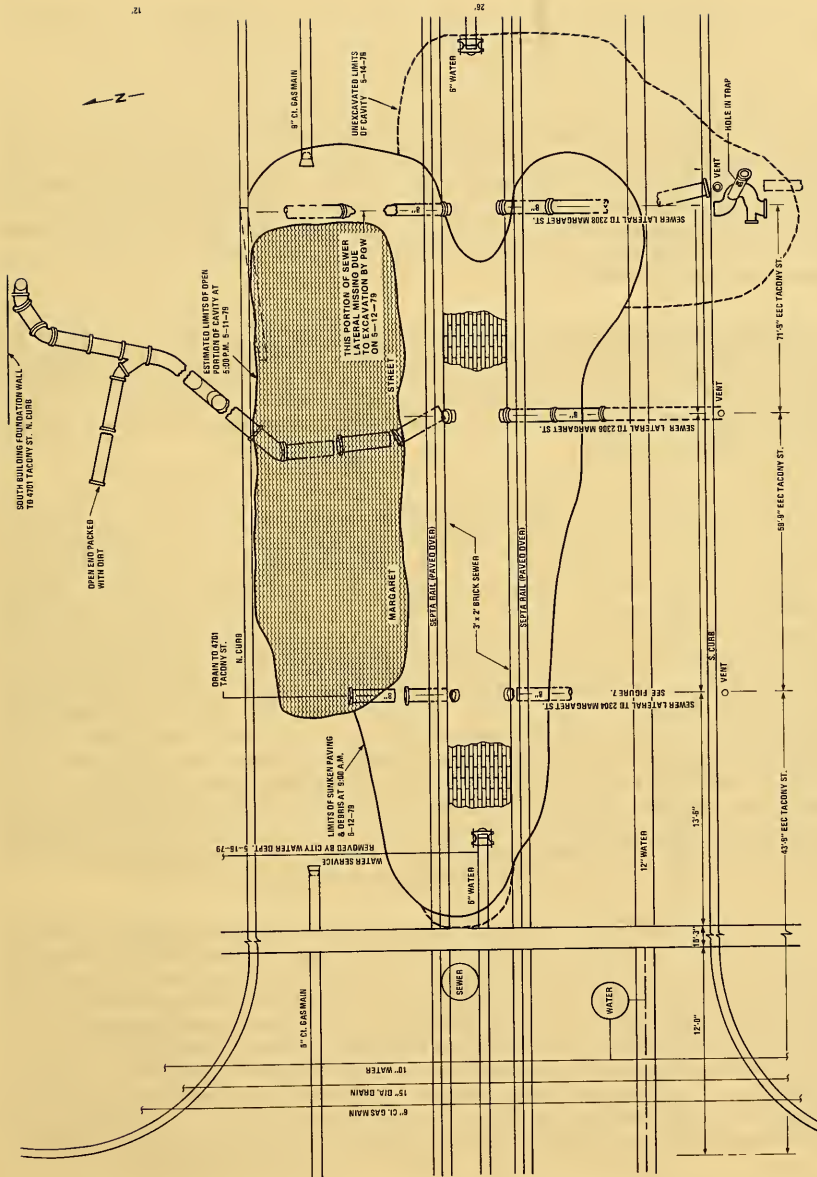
Plan view of initial cave-in with adjacent damaged sanitary sewer laterals.
